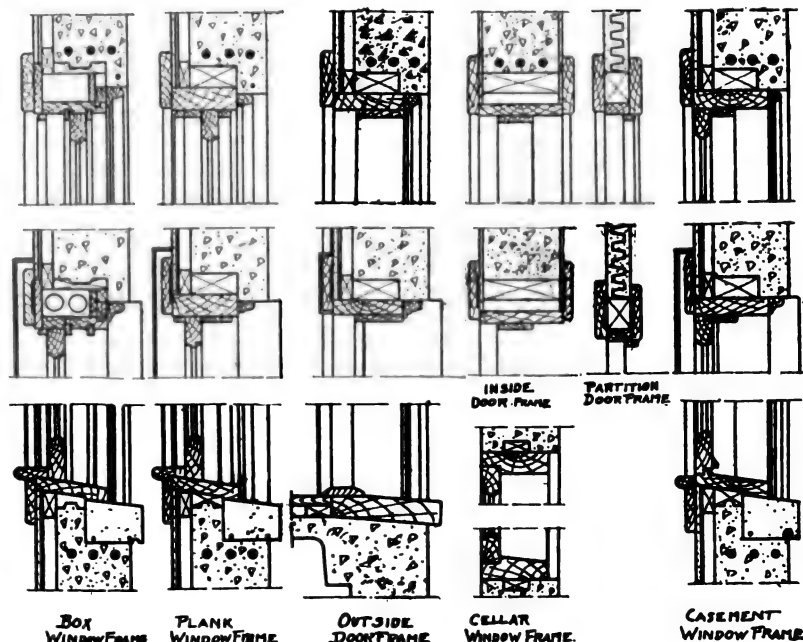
DETAILS OF WINDOW AND DOOR FRAME CONSTRUCTION
